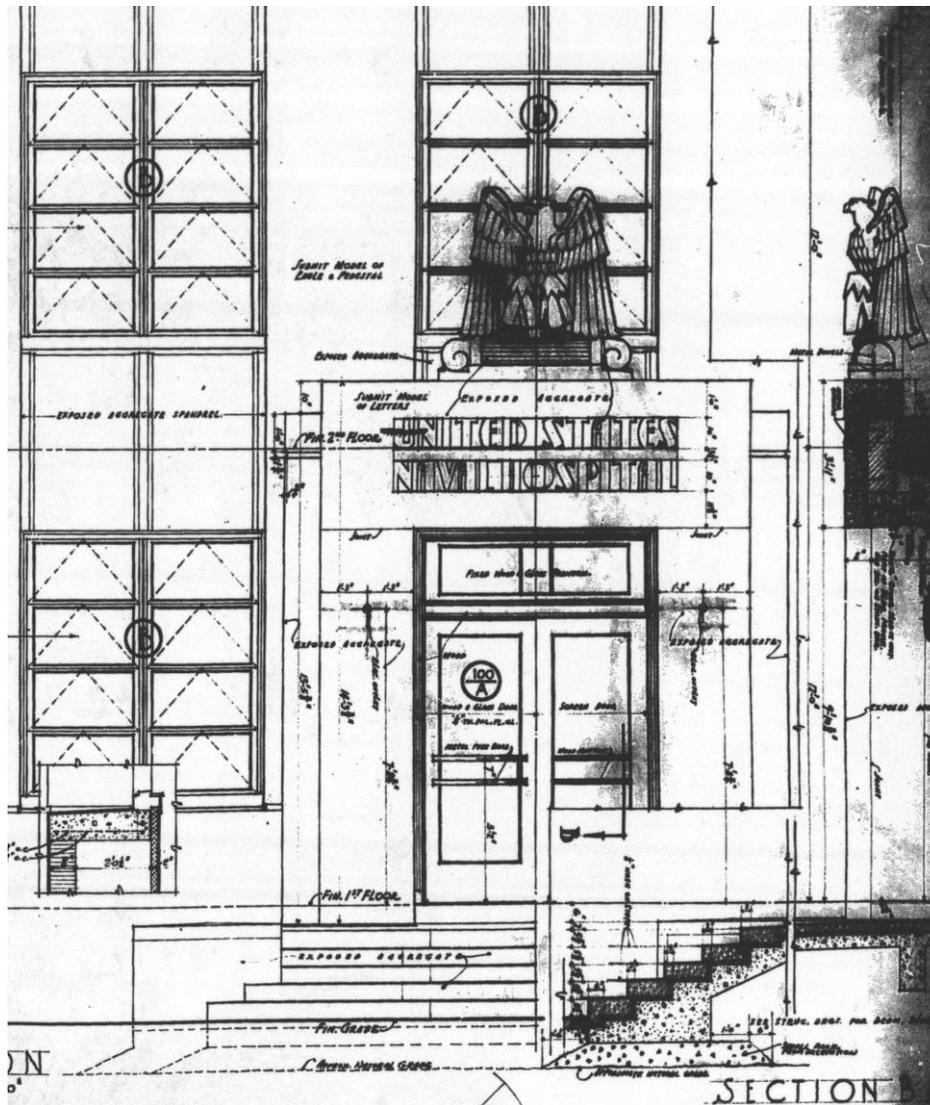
Detail elevation and section of main entrance at Naval Hospital Key West, Florida, February 1942 (NARA College Park, RG 71 700-31).
